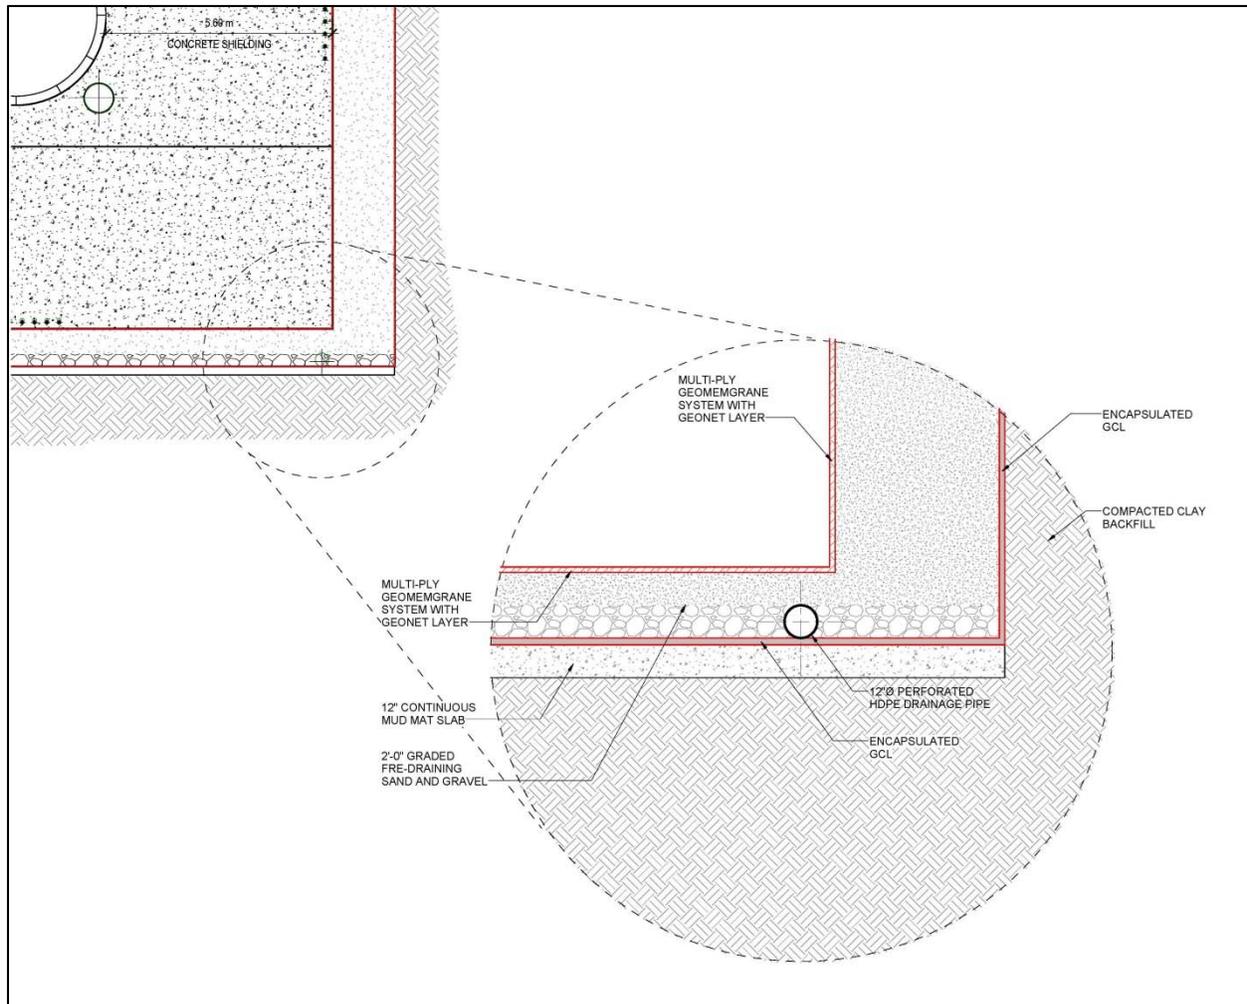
Decay Pipe Cross Section Showing the Base of the Decay Pipe Barrier System
